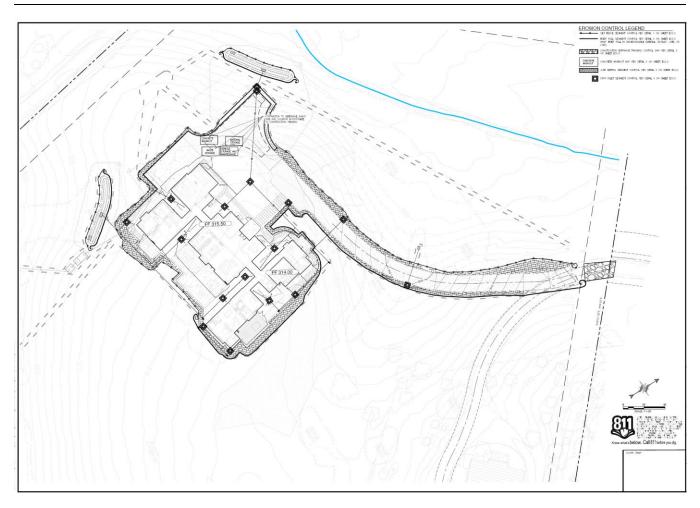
Preliminary Erosion and Sedimentation Plan
